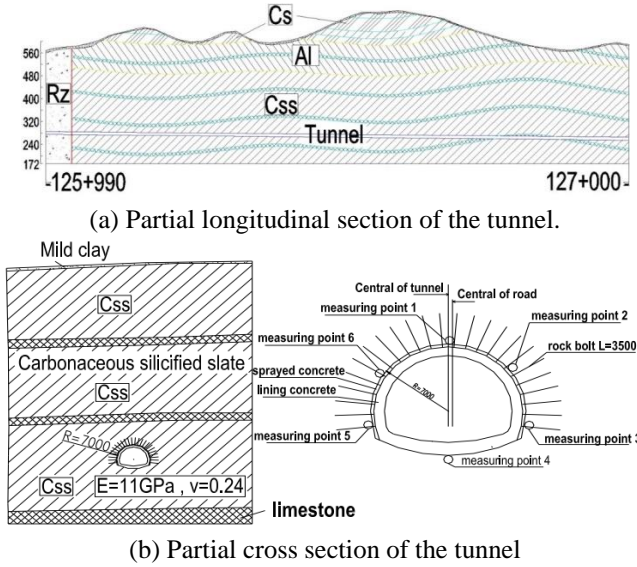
Partial longitudinal section and the partial cross section of Yan-zi-dong tunnel.
